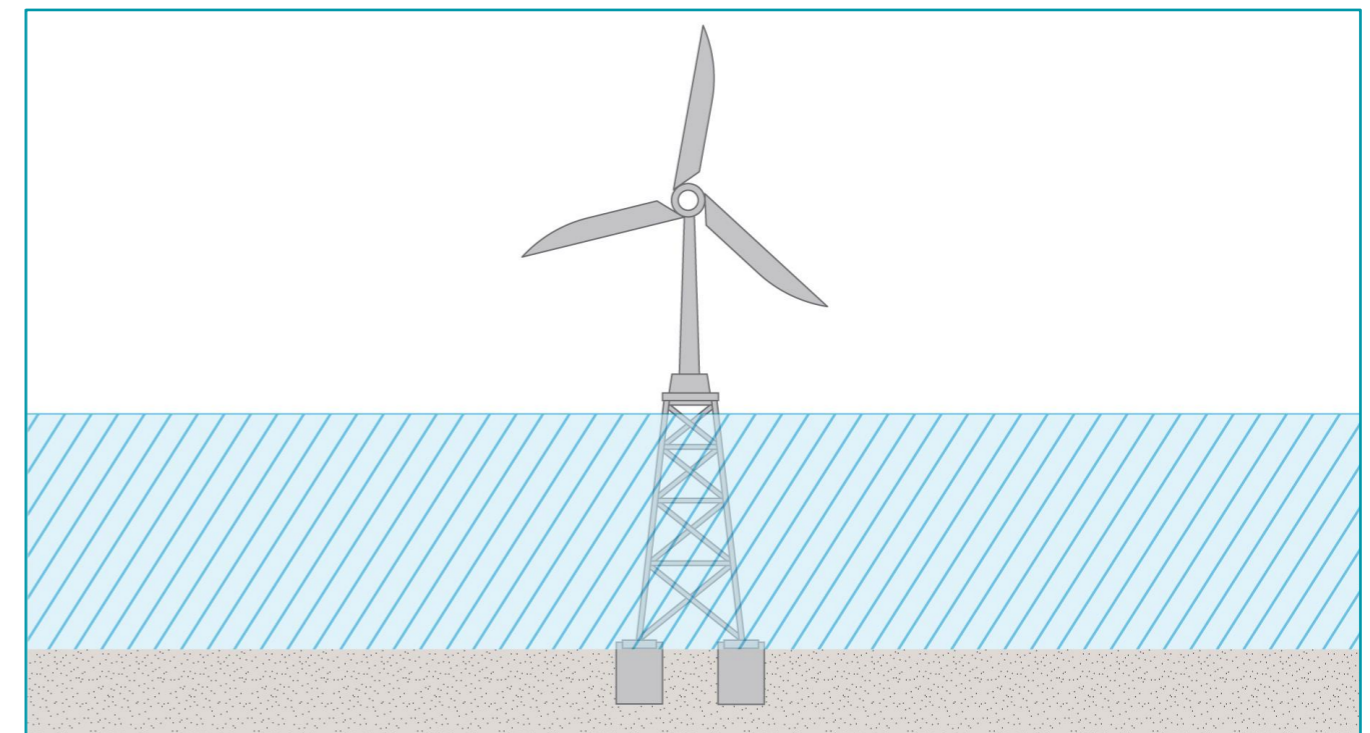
Indicative Schematic of a Jacket Foundation with Suction Caissons
